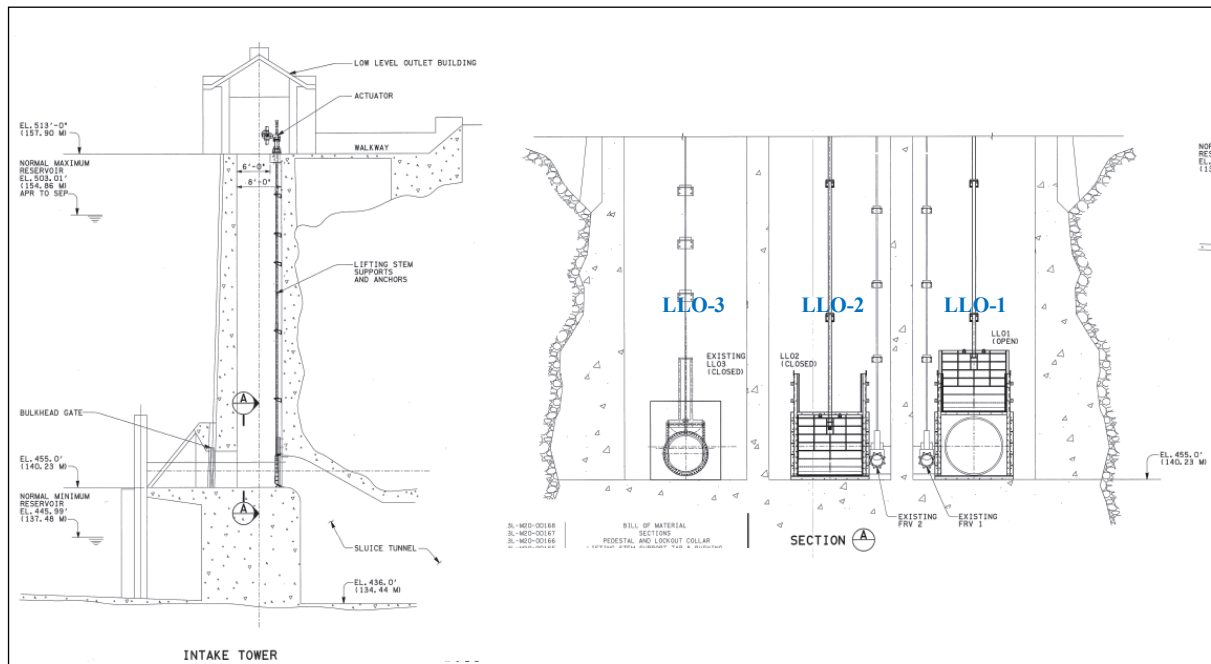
Section Views of the Sluice Tower and Low Level Outlet Gates.
